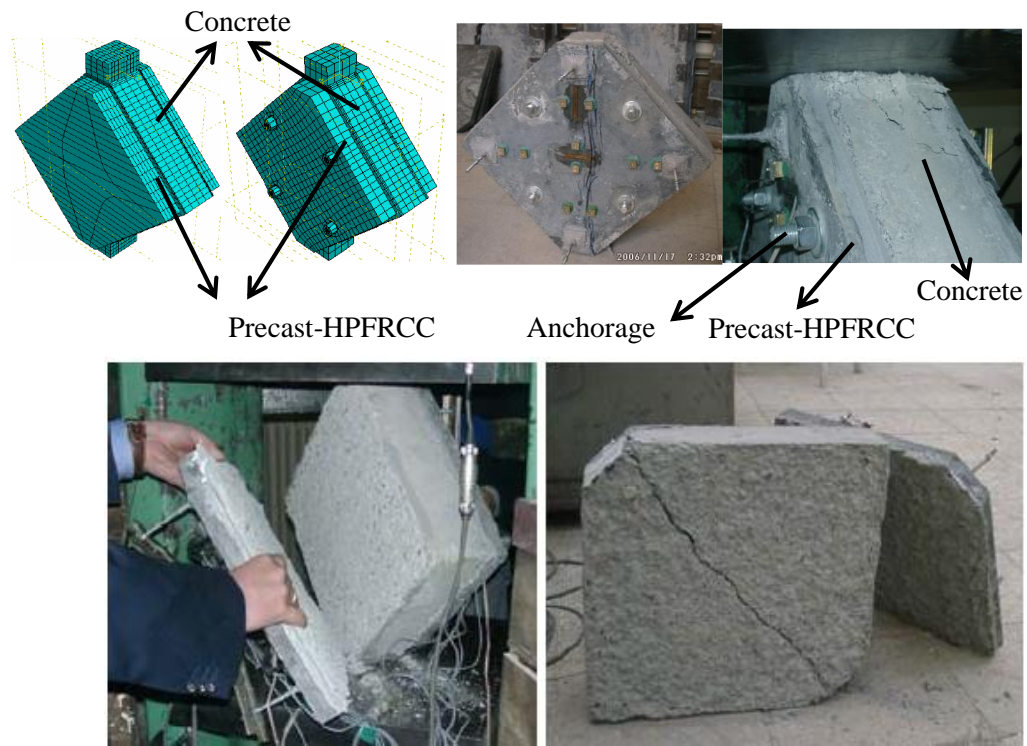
Finite element model and typical failure modes of retrofitted specimens
